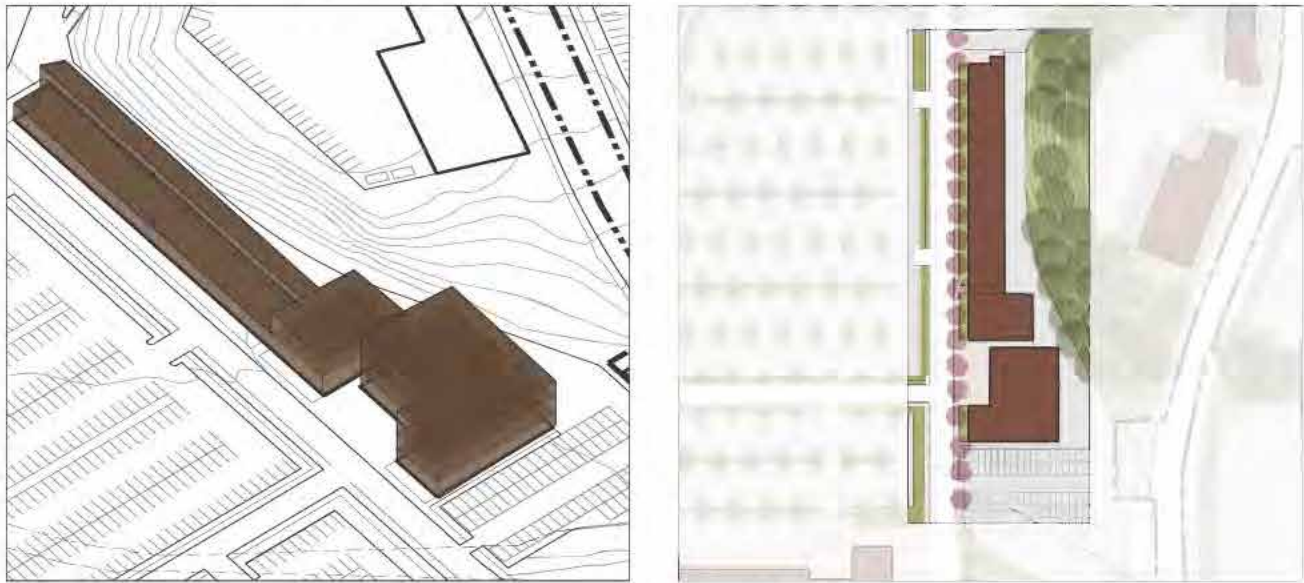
Axonometric and Site Plan of new Automotive Technology and Applied Technology buildings
